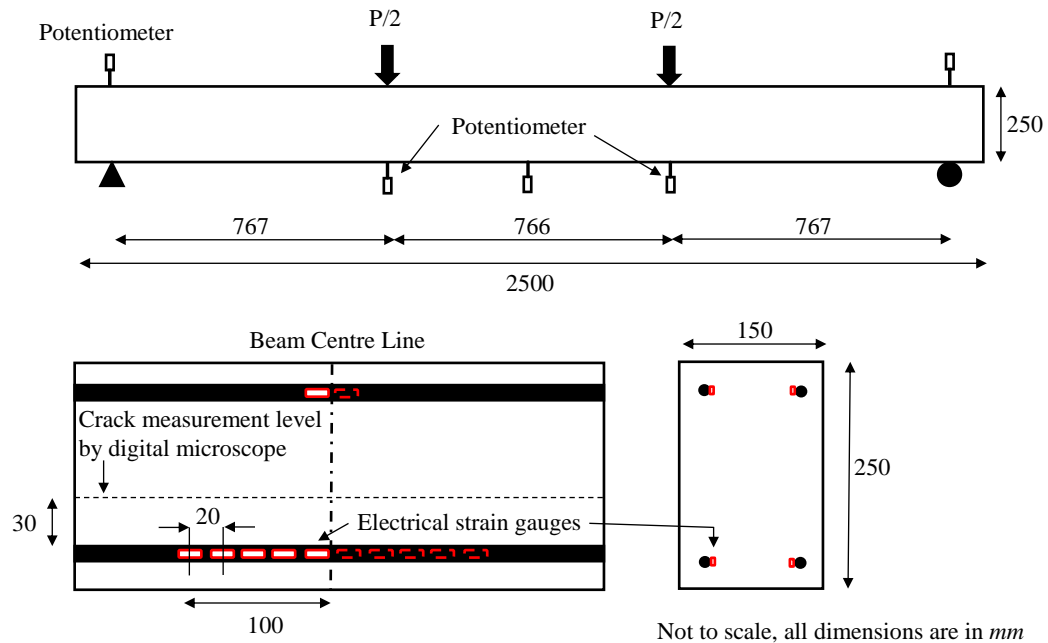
Beam typical cross section details, loading layout and distribution of instrumentations.
